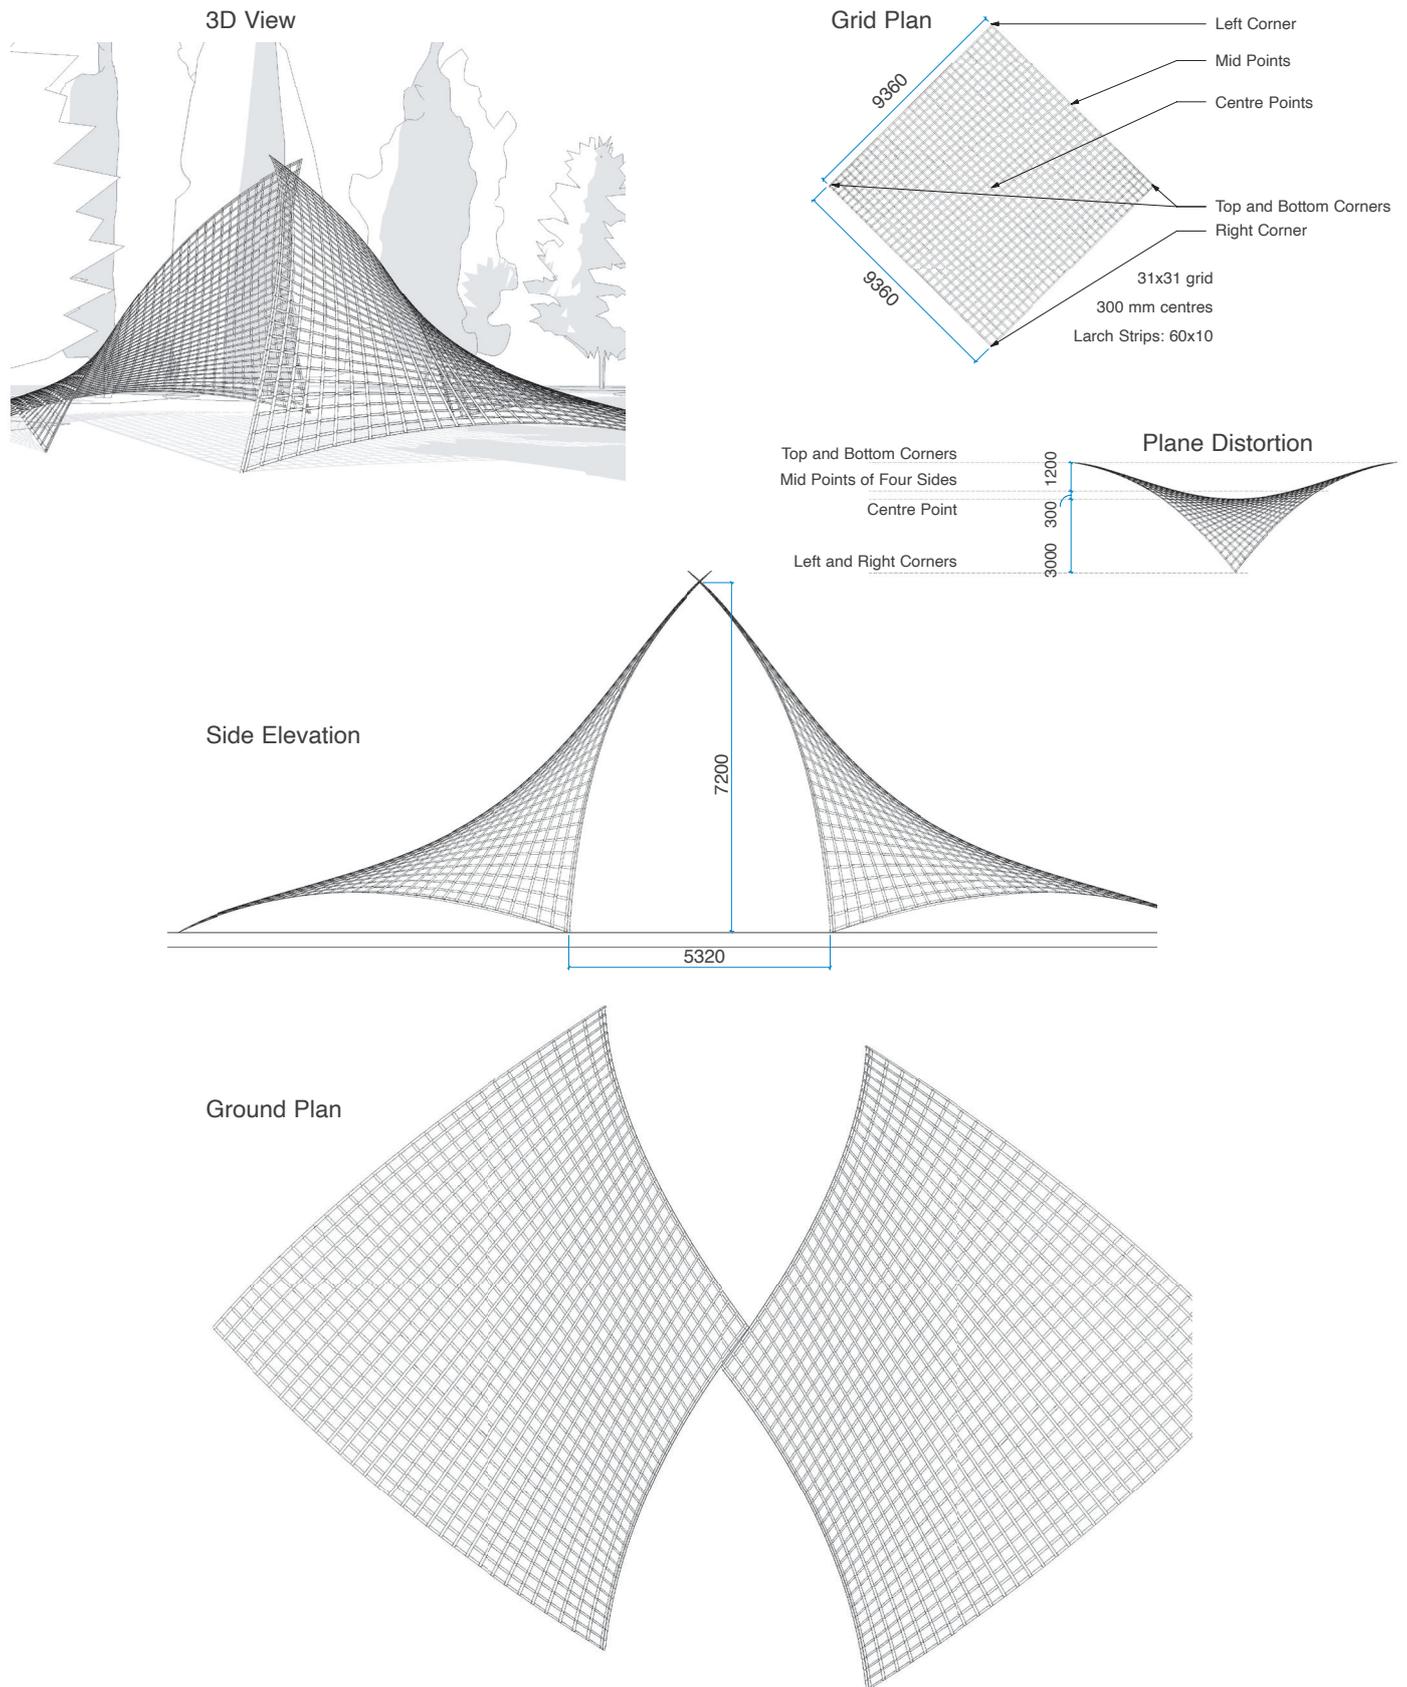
Concept drawing (3D Model) showing grid plan, "ground" plan, elevation, plane distortion & 3D view.
